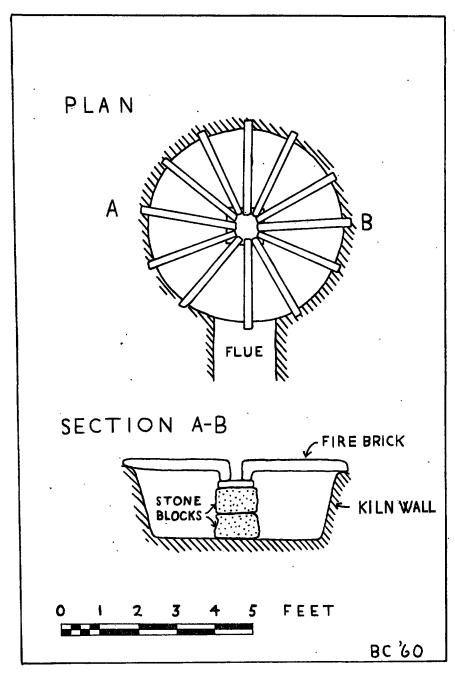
Hallcourt Wood Kiln. Diagrammatic reconstruction of the kiln furniture
